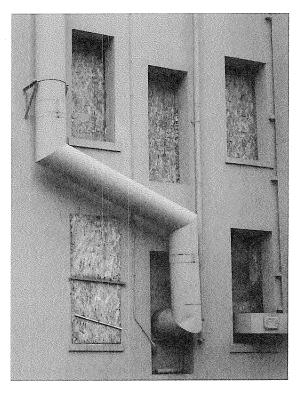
Detail photograph of ventilation ducts projecting through second floor openings. Note size difference between window and door openings (photograph taken on 01/26/2018).
